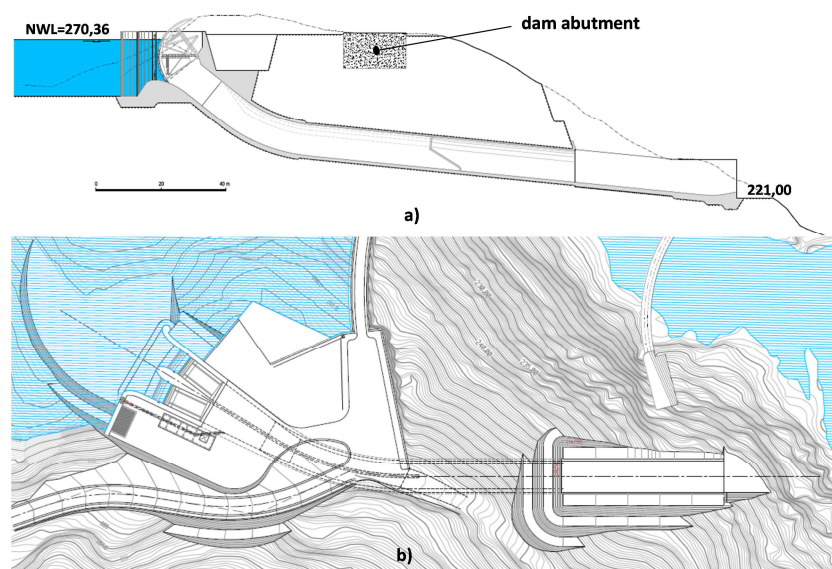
Complementary spillway: a) longitudinal profile view; b) plan view
